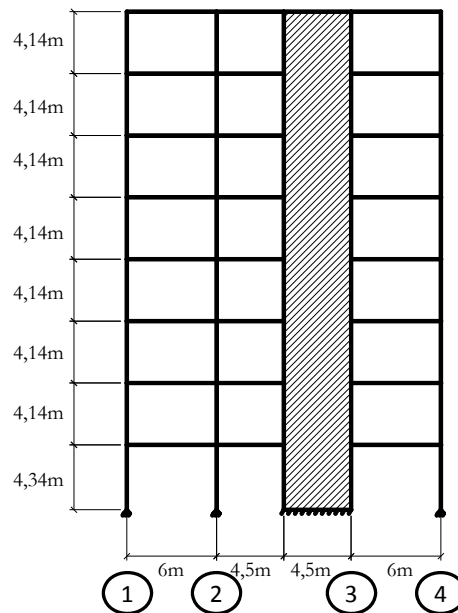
Geometry of sub-structure I, office building alignment A
